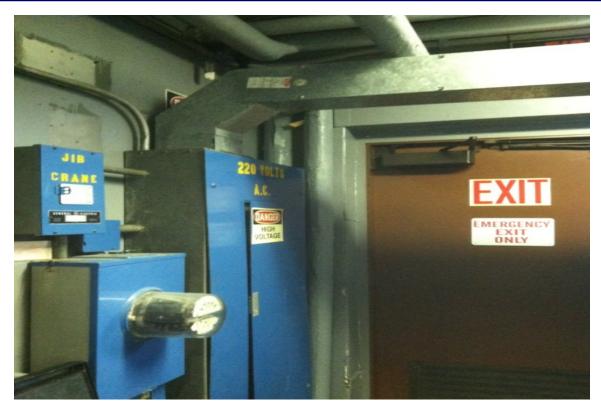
PACM Concrete Board and Pipe Insulation – Hard Pack Elbow and Tees (Generator Room)
